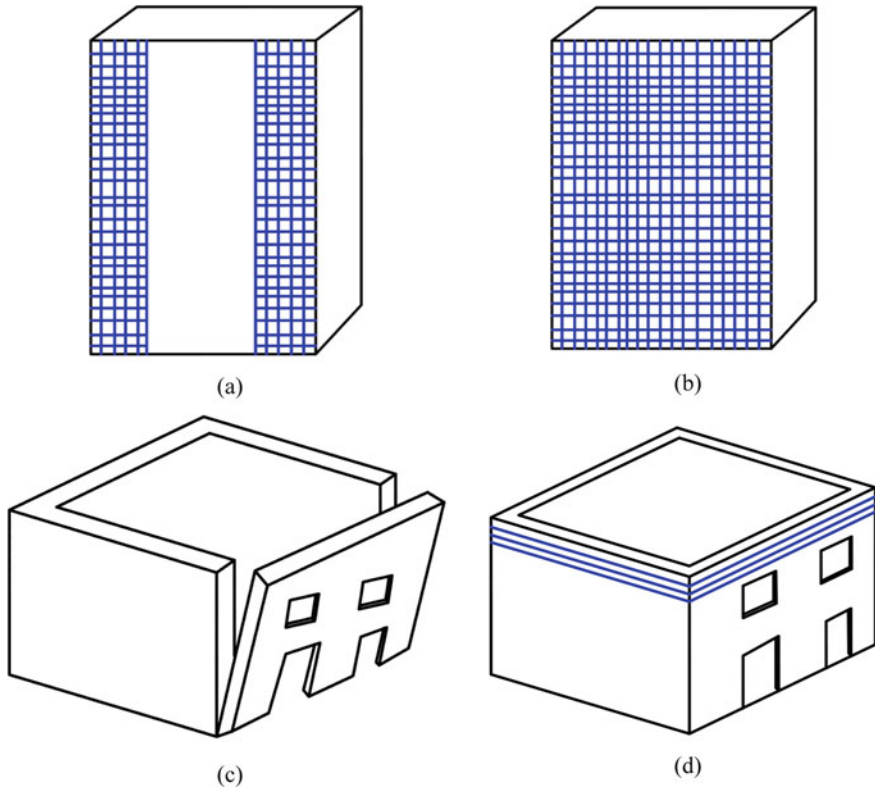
Seismic strengthening of masonry walls. a Partial wrapping scheme against in-plane bending stresses; b full wrapping scheme against in-plane bending stresses; c out of plane failure and d strengthening against out of plane failure
